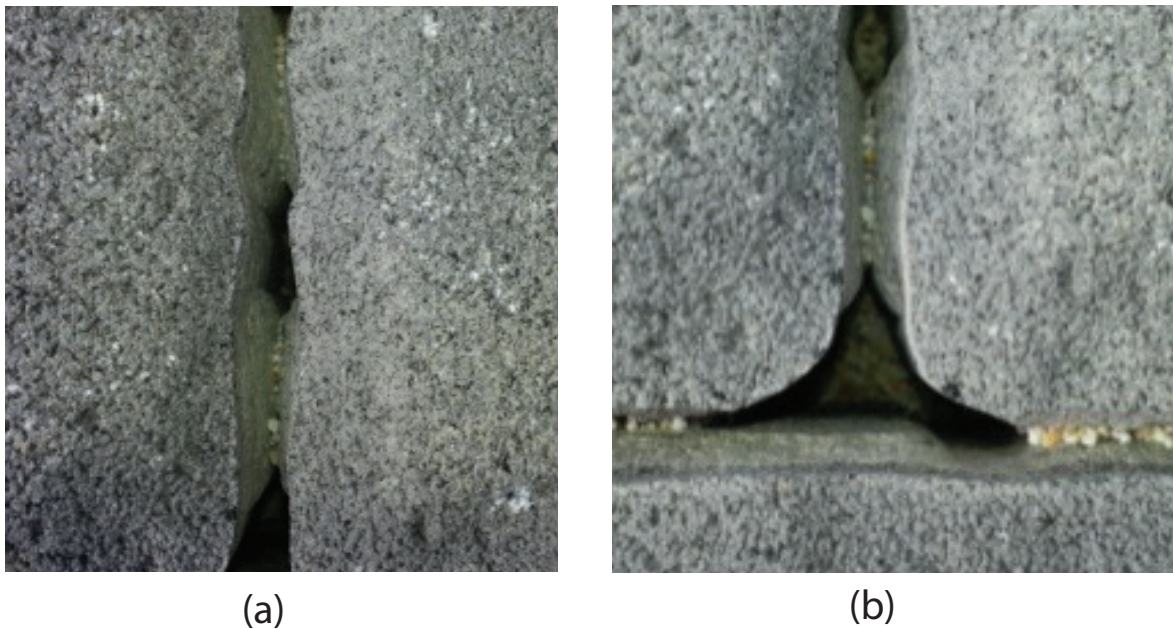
Type of permeable block joint: (a) linear joint and (b) crossing joint.
